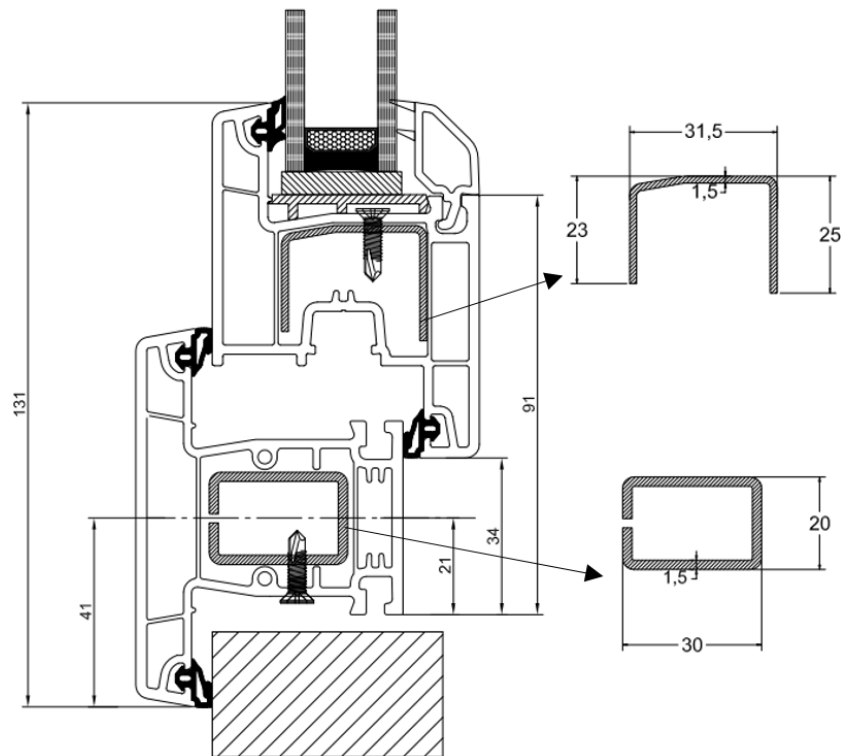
Cross-section sketch of window frame structure with reinforced cores.
